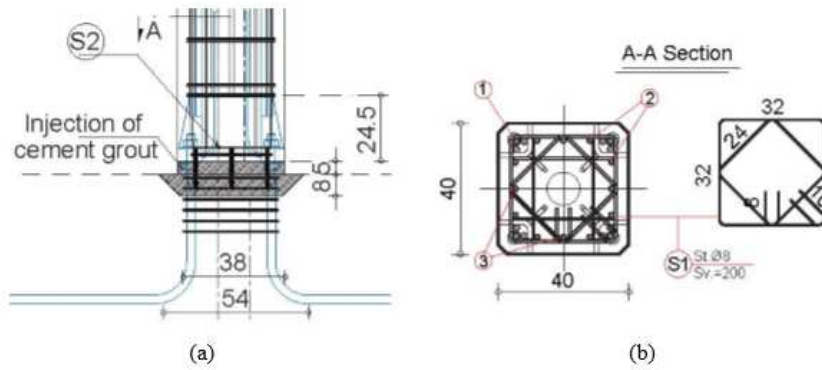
(a) Column to foundation details; (b) steel pins added to resist shear action (10)
